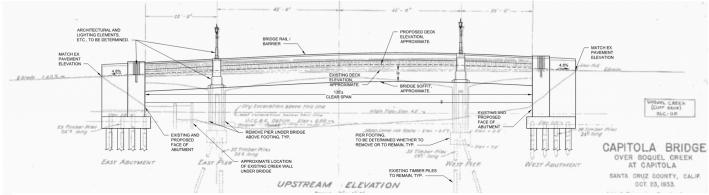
Preliminary Longitudinal Section of Bridge Replacement
